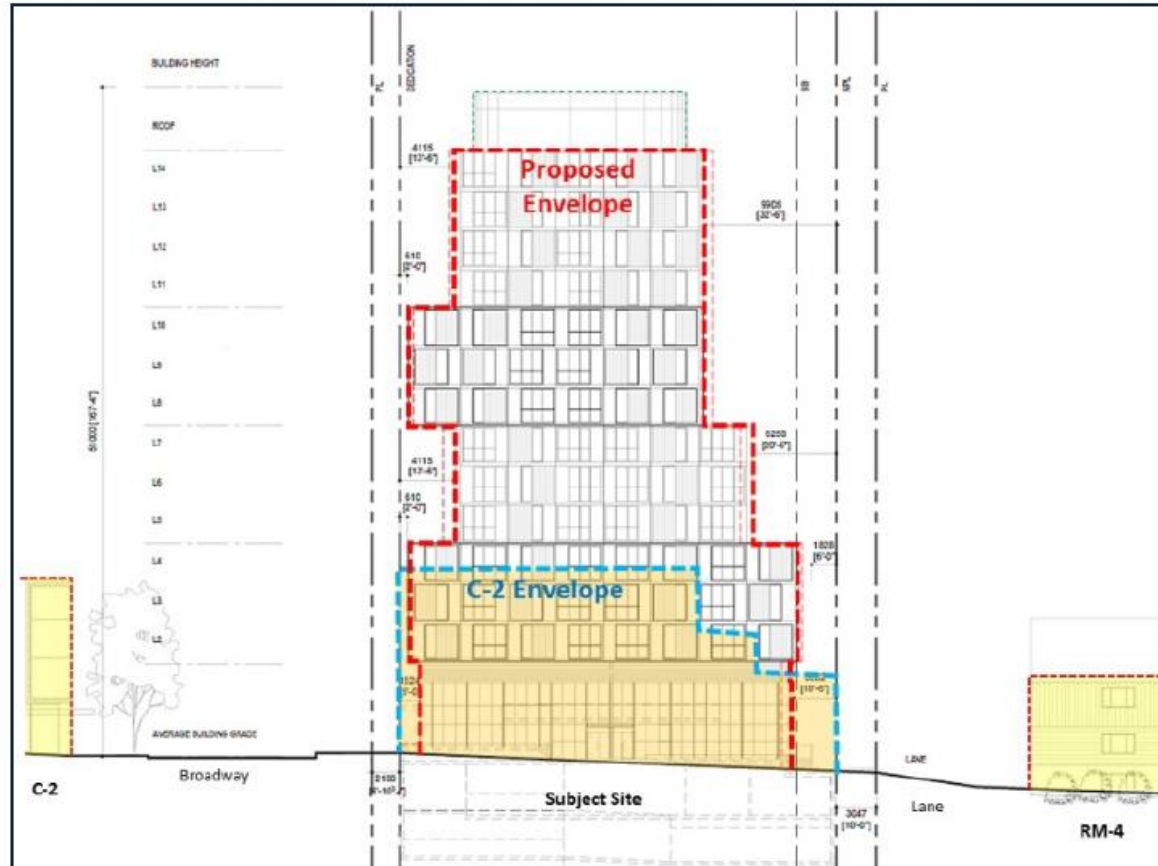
shows the proposed Alma Street elevation and compares a typical C-2 building profile (blue dotted line) to the proposed building envelope (red dotted line). For further context, the existing C-2 building across Broadway and the RM-4 building across the lane to the north, are shown.
